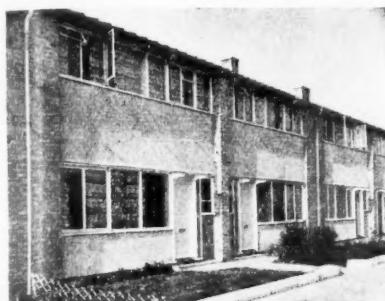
Crosswall construction houses at Canterbury which gave an average saving of £64 per house
